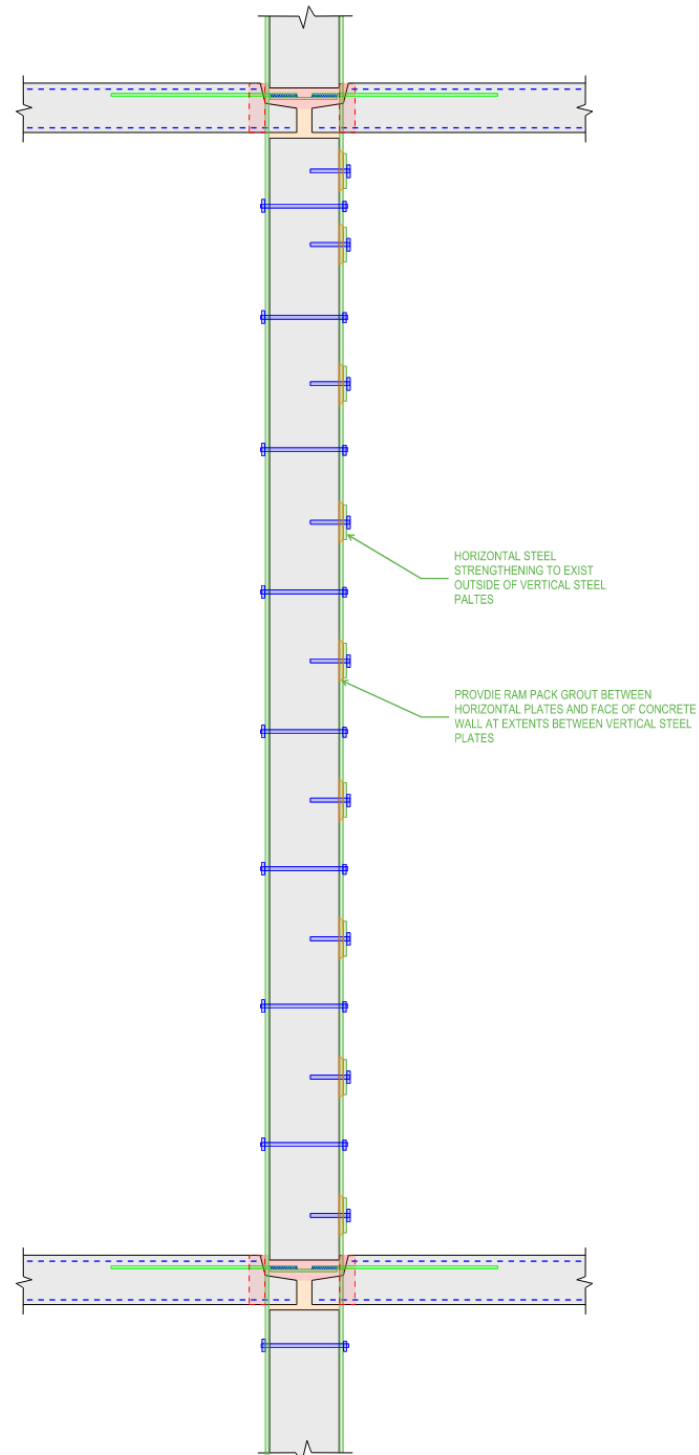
Cross-section view of wall indicating arrangement where vertical and horizontal strengthening plates are required.
